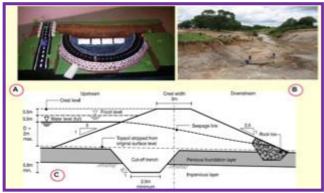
A- Model view of Flood harvesting system, B- View of Shivnath river during summer near old bridge and C- typical section of an earthen dam to store flood water.
